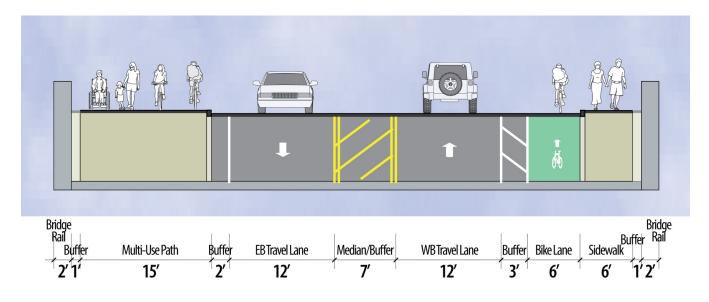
CROSS SECTION OF THE BAKER ROAD OVERCROSSING OF US 97, FACING WEST (ASSUMES A ROUNDABOUT IS CONSTRUCTED AT THE NORTHBOUND RAMPS)
